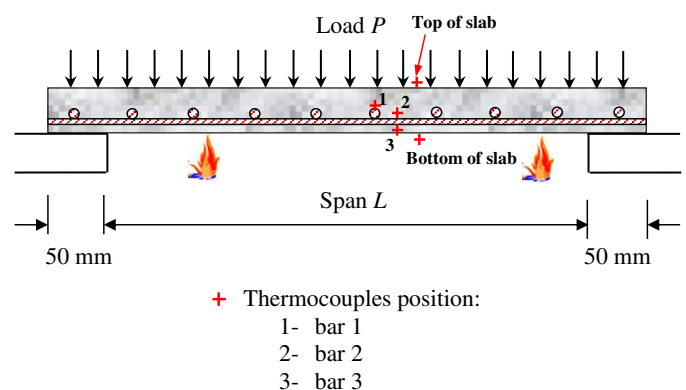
Details of tested reinforced concrete slabs under fire conditions (adapted from Bailey and Toh 2007)
